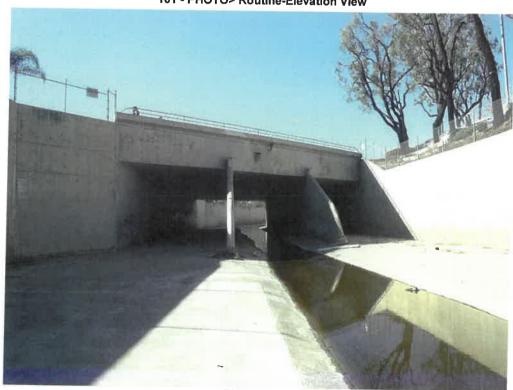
SIDE VIEW LOOKING SOUTHWEST
